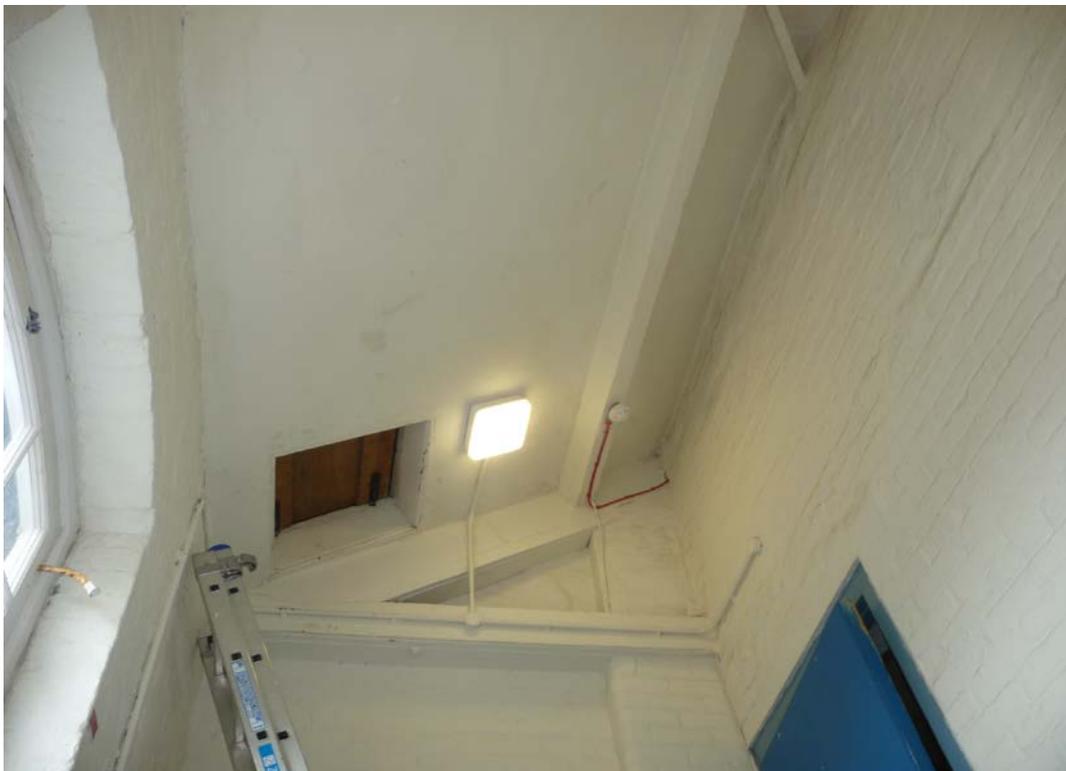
Rotten section of wall plate adjacent to 10 Gloucester Street.
